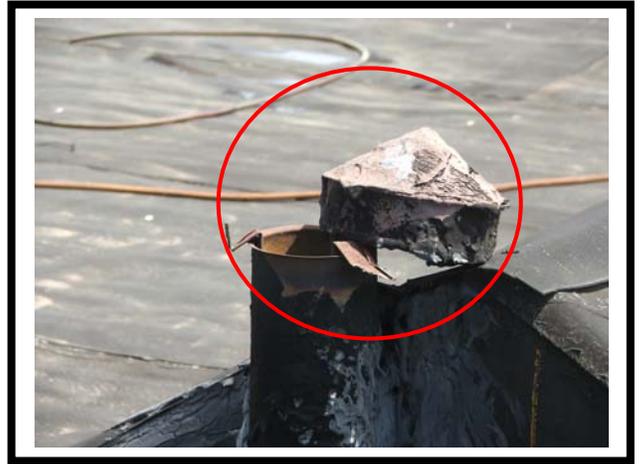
Plumbing Vent Cap Has Fallen off pipe on Roof – Water Leak Potential
